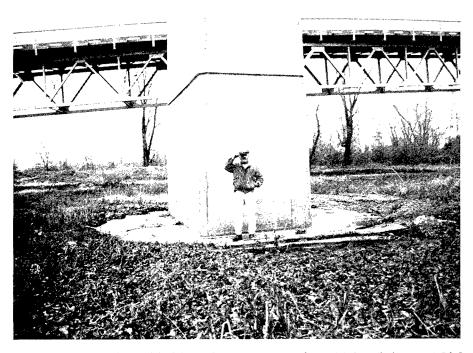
Railroad bridge pier (upstream from U.S. Highway 159 bridge) protected from Missouri River floodplain flow by wide foundation, near Rulo, Nebraska.
